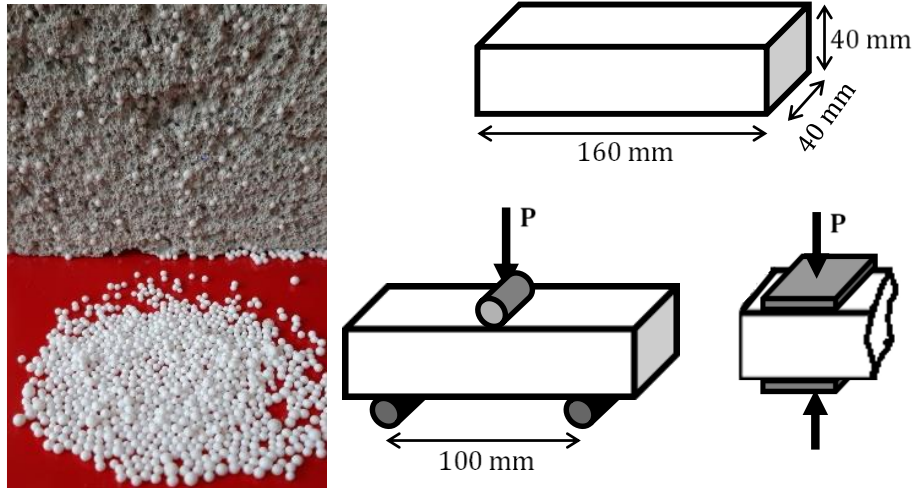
Mixture, EPS beads, schematic draw of specimens and tests.
